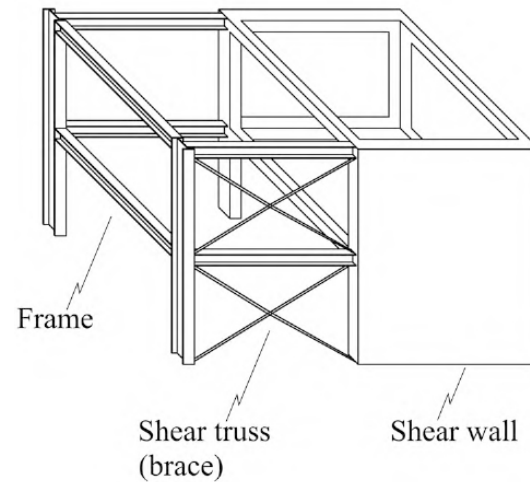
Rigid frame, shear truss (brace), and shear wall
